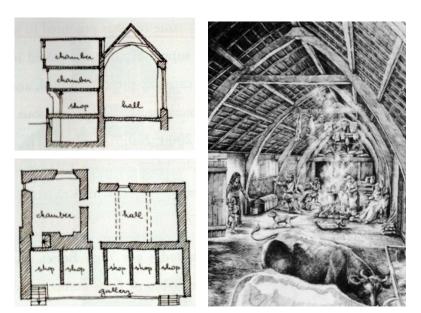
Medieval *Hall* house plan and section Fig. 2 – Medieval *Hall* house depiction (Salvador, 2014, pp.130-131)
